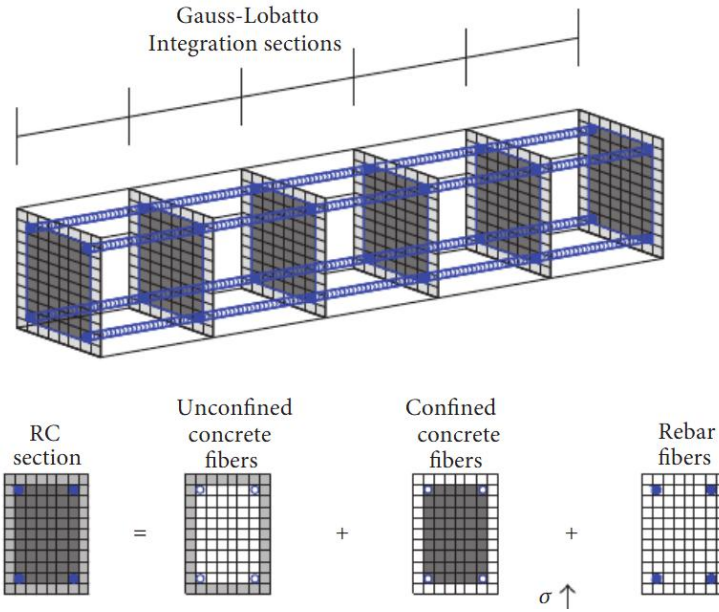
Example of fibre discretization of a beam-column element for a reinforced concrete cross-section
